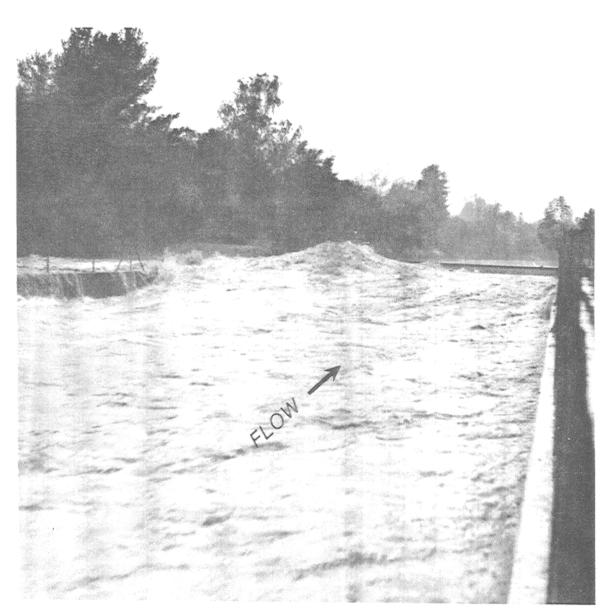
Flood of 16 February 1980, Los Angeles River at Cedros Street, approximately 1.5 river miles below Sepulveda Dam (view toward downstream, showing overflow of left bank resulting from hydraulic instability due to a side drain in the channel wall).
